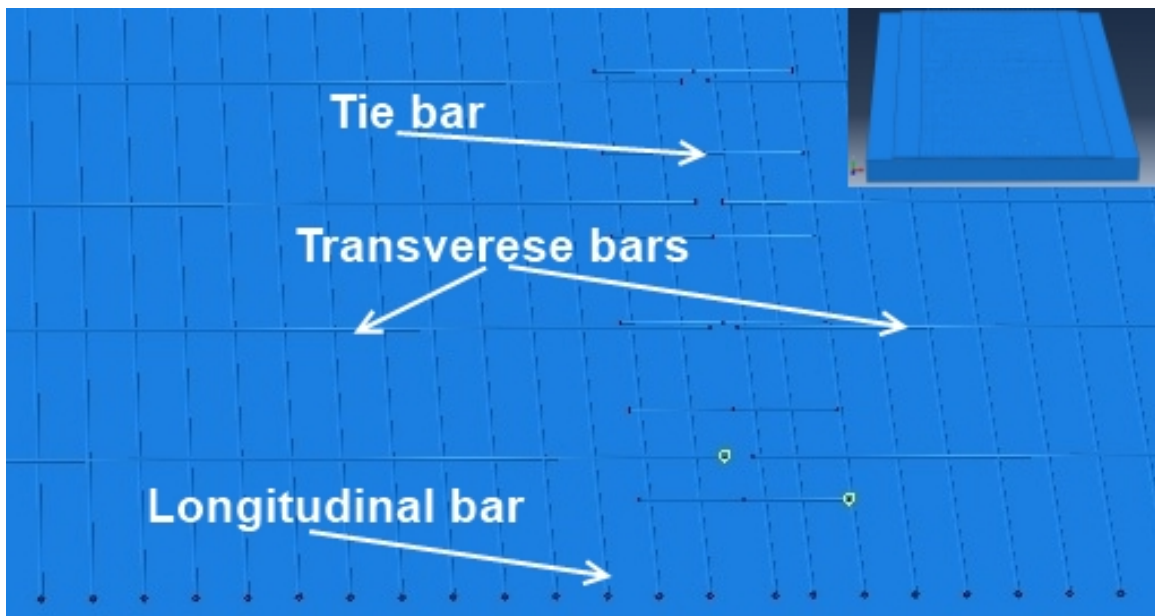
Arrangement of reinforcing bars in the pavement with 0.6 % longitudinal steel
